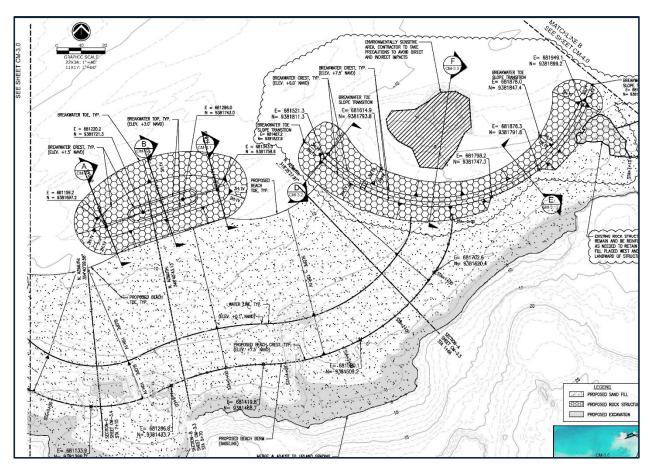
Redesign of Breakwater 2 (Source: East Beach Plan, Cummins Cederberg Coastal and Marine Engineering (2020-04-16)
